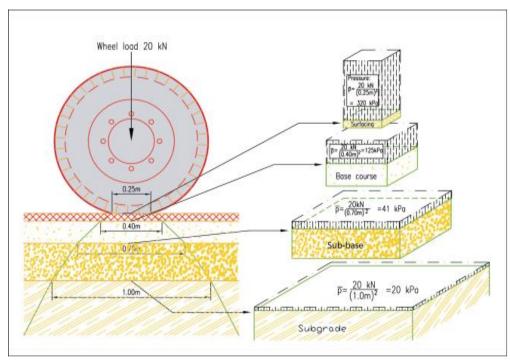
Typical load spreading in a flexible road pavement. Source: Botswana Roads Department (2005): Page 12
